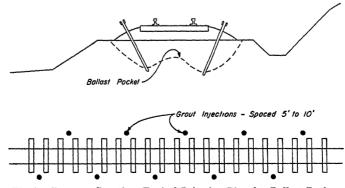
Pressure Grouting. Typical Injection Plan for Ballast Pockets.
